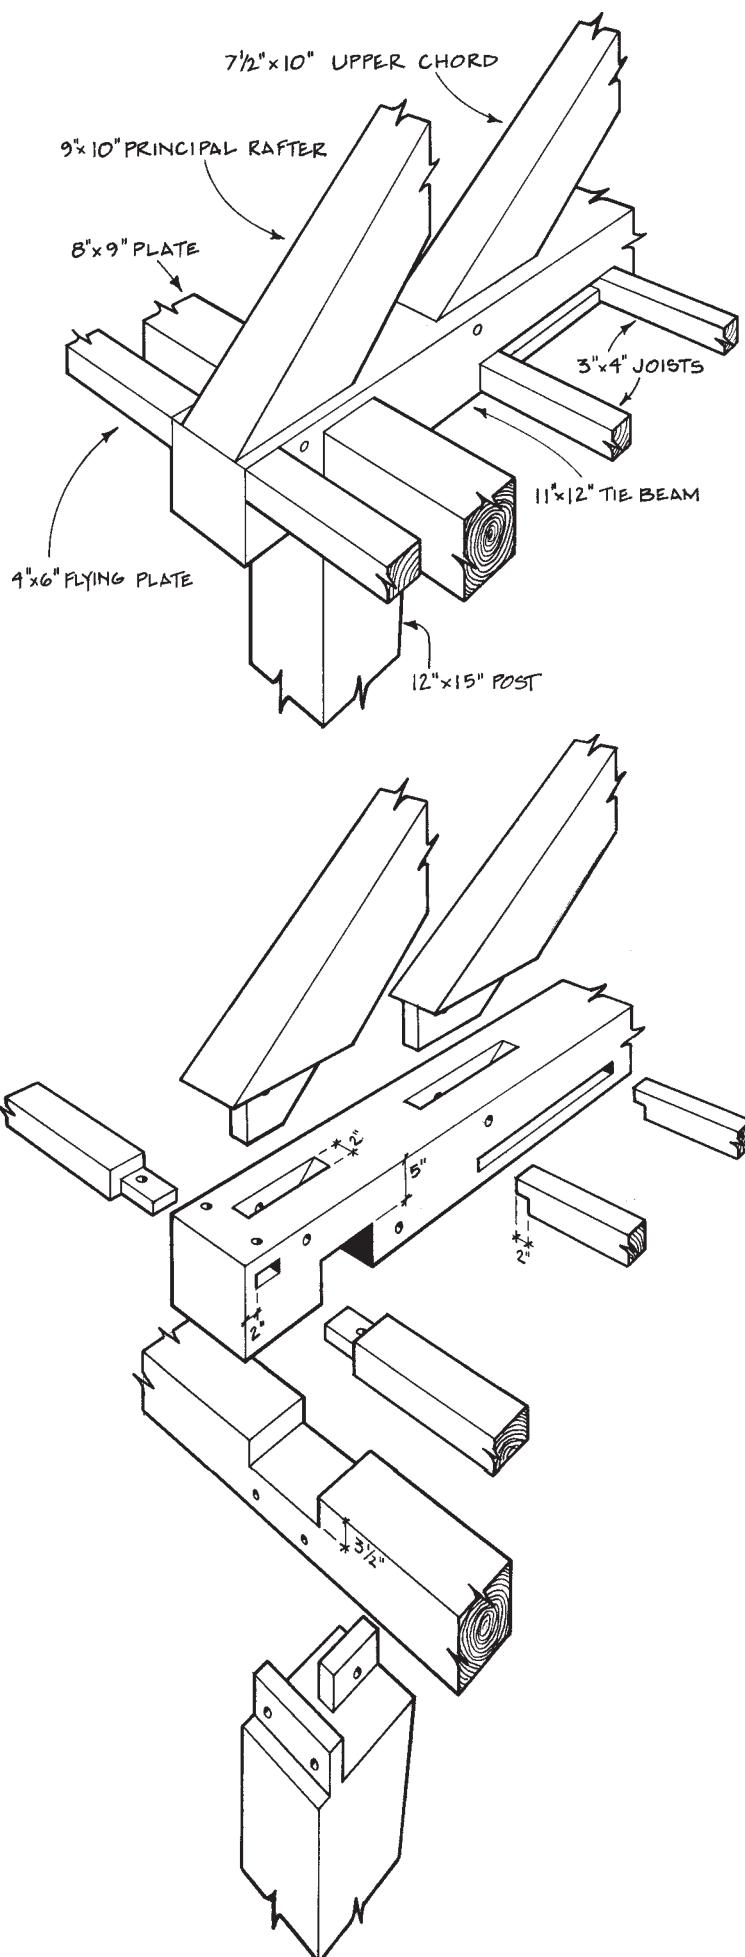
STAFFORD MEETINGHOUSE, ASSEMBLED AND EXPLODED VIEWS OF TYING JOINT WITH UPPER CHORD SEATS.
